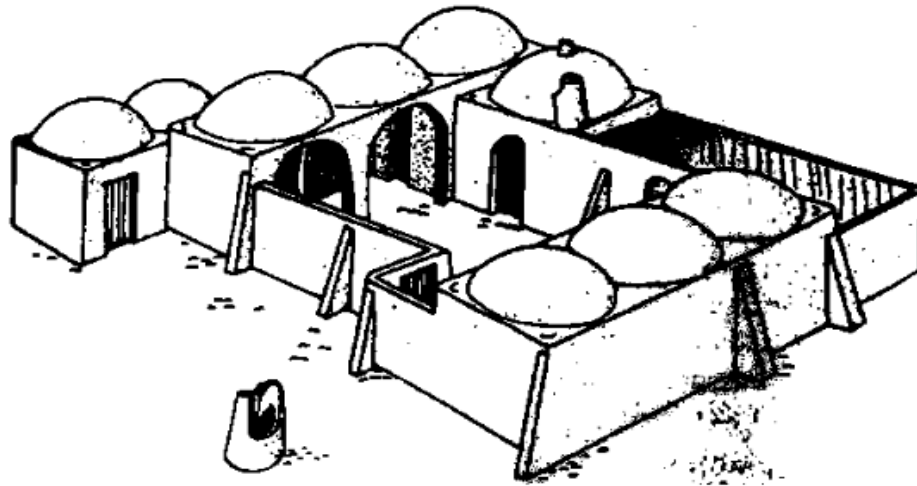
Traditional towns with domed and vaulted roofs: Souf house [58]
